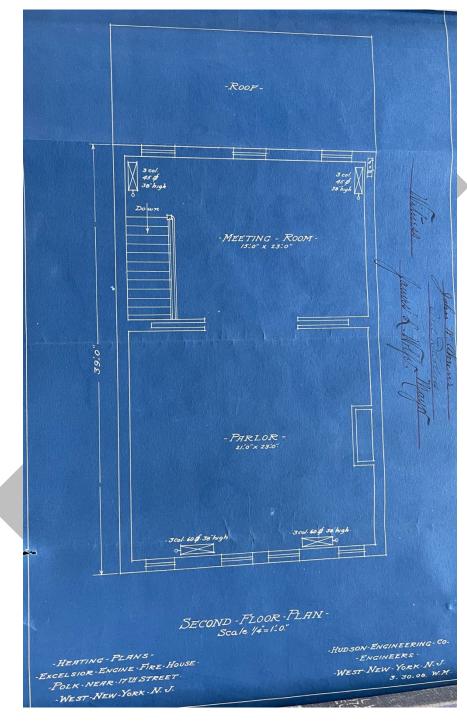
Heating Plans – Second Floor – Hudson Engineering Company, 1908 Complements of the Town of West New York
